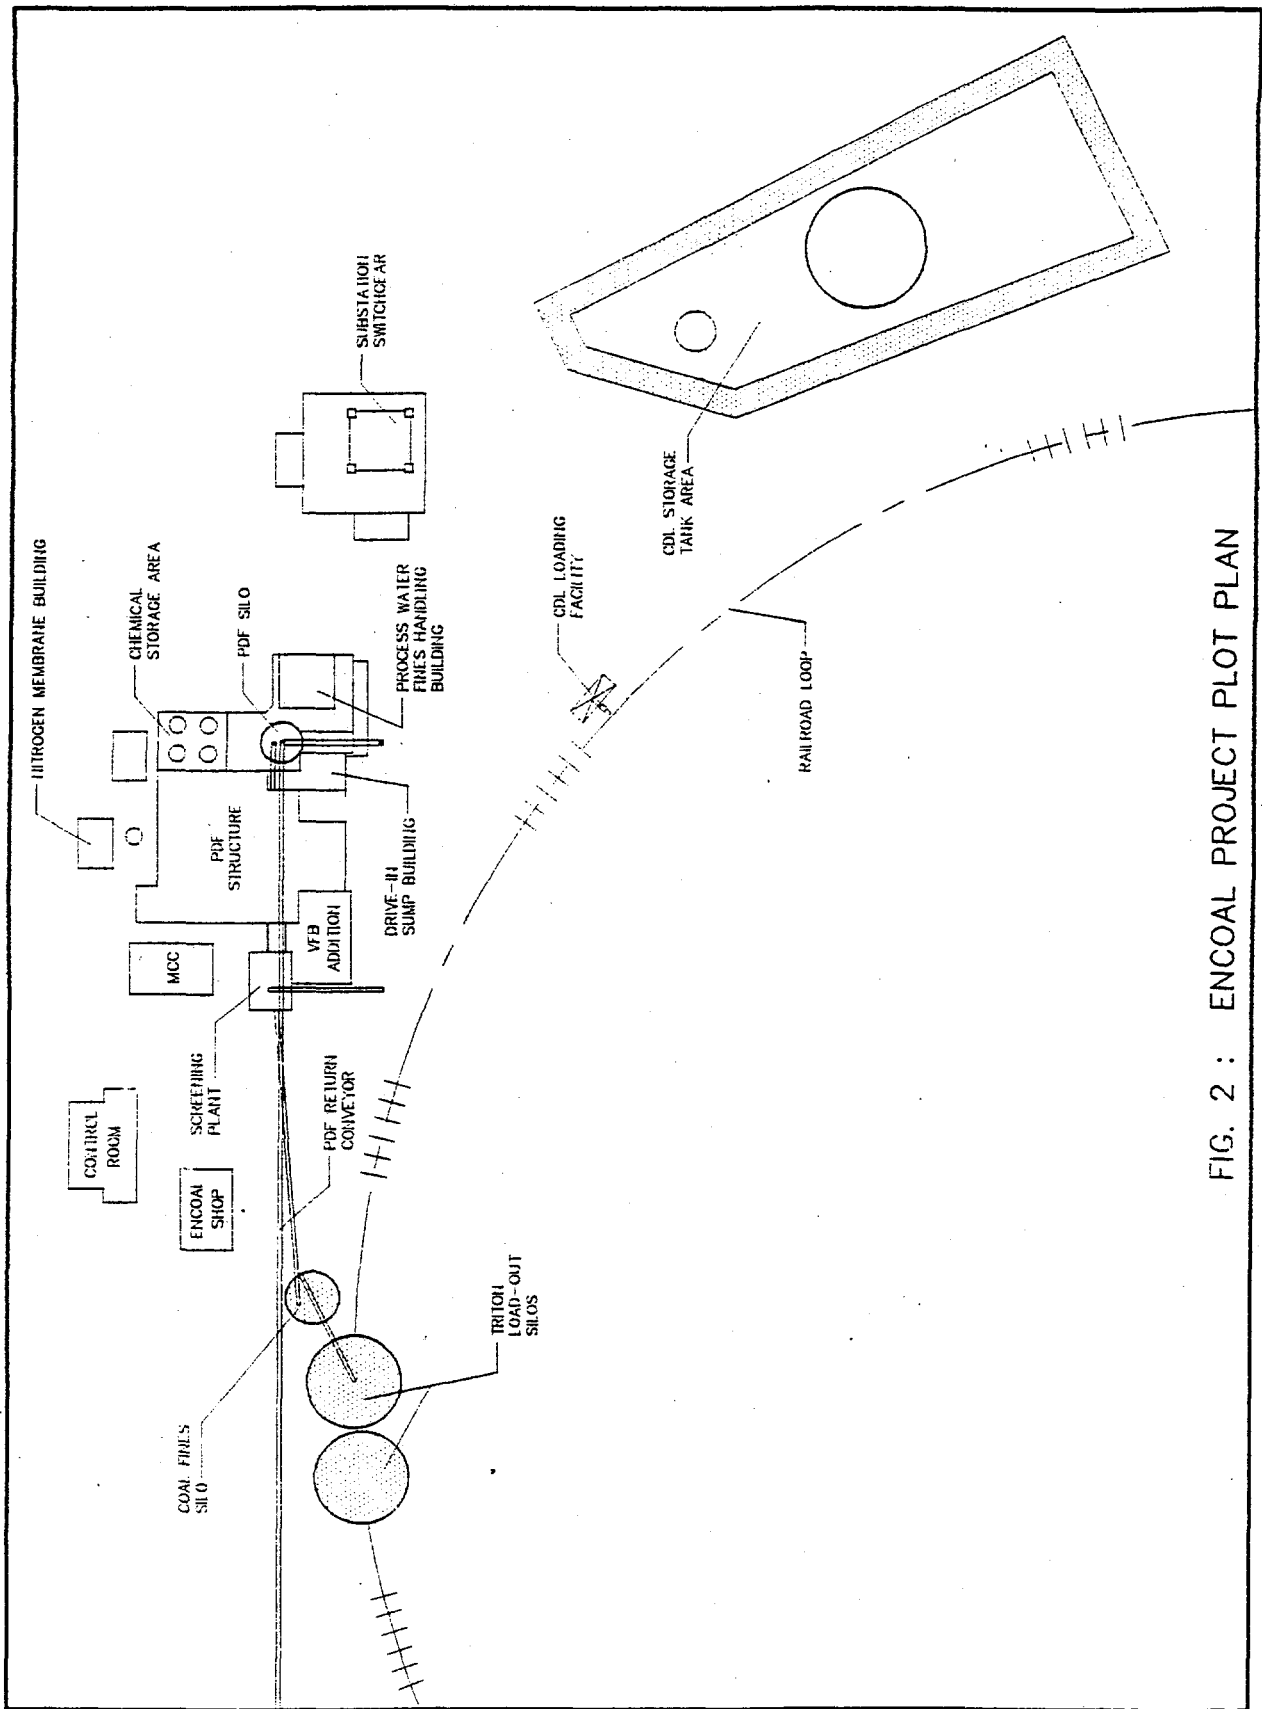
ENCOAL PROJECT PLOT PLAN
